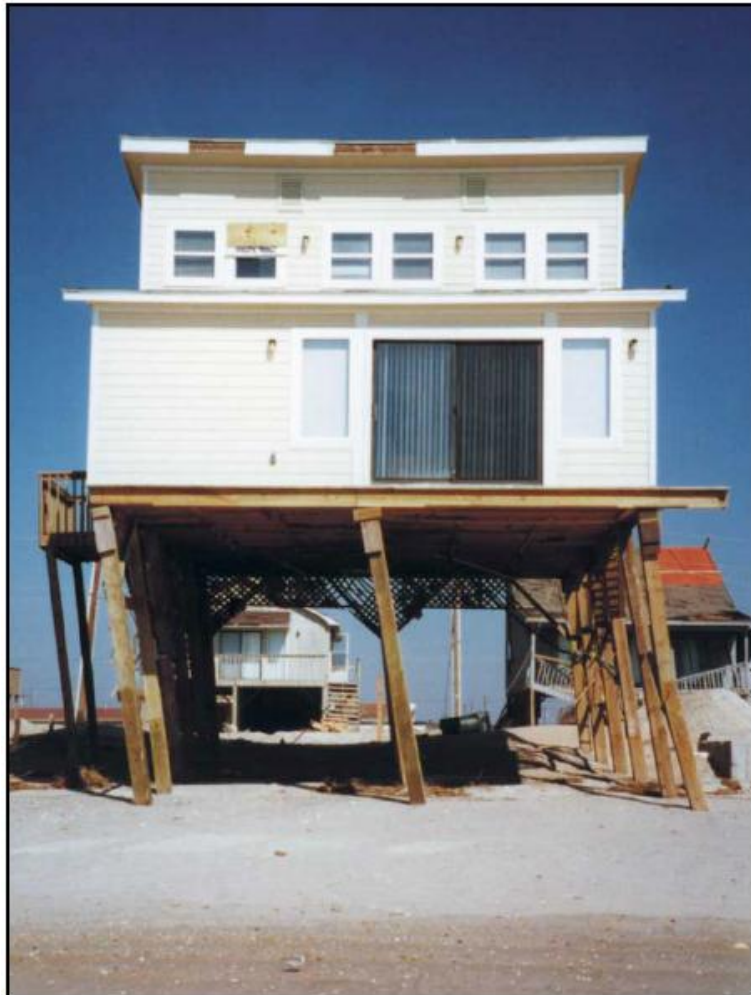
Hurricane Fran (1996). Many oceanfront houses built before the enactment of the 1986 North Carolina State Code were found to be leaning or destroyed.
